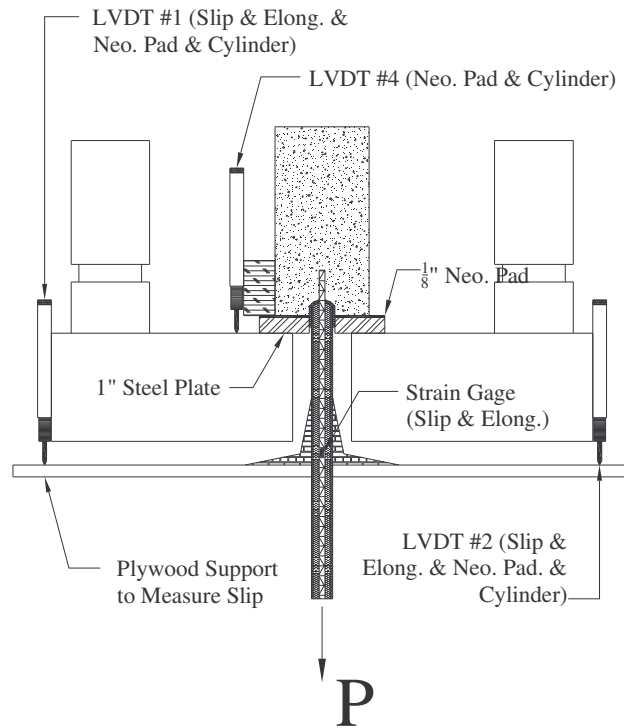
AutoCAD Drawing Representation of Pullout Test Setup
